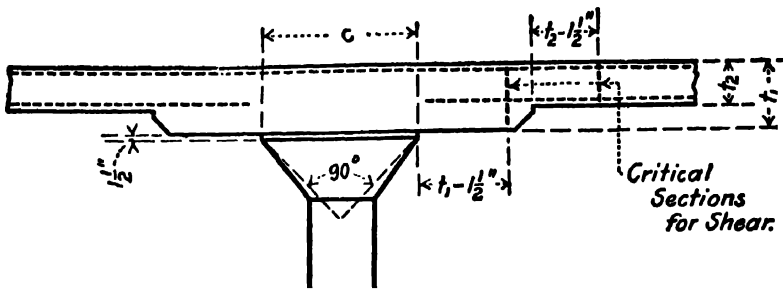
Typical column capital and sections of flat slab with dropped panel.
